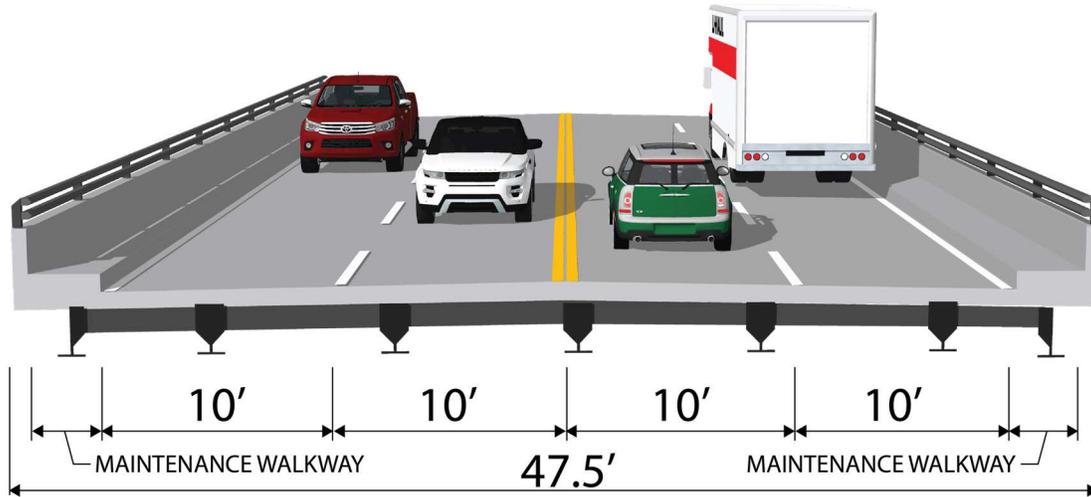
Existing Roadway Typical Section – Causeway Island
